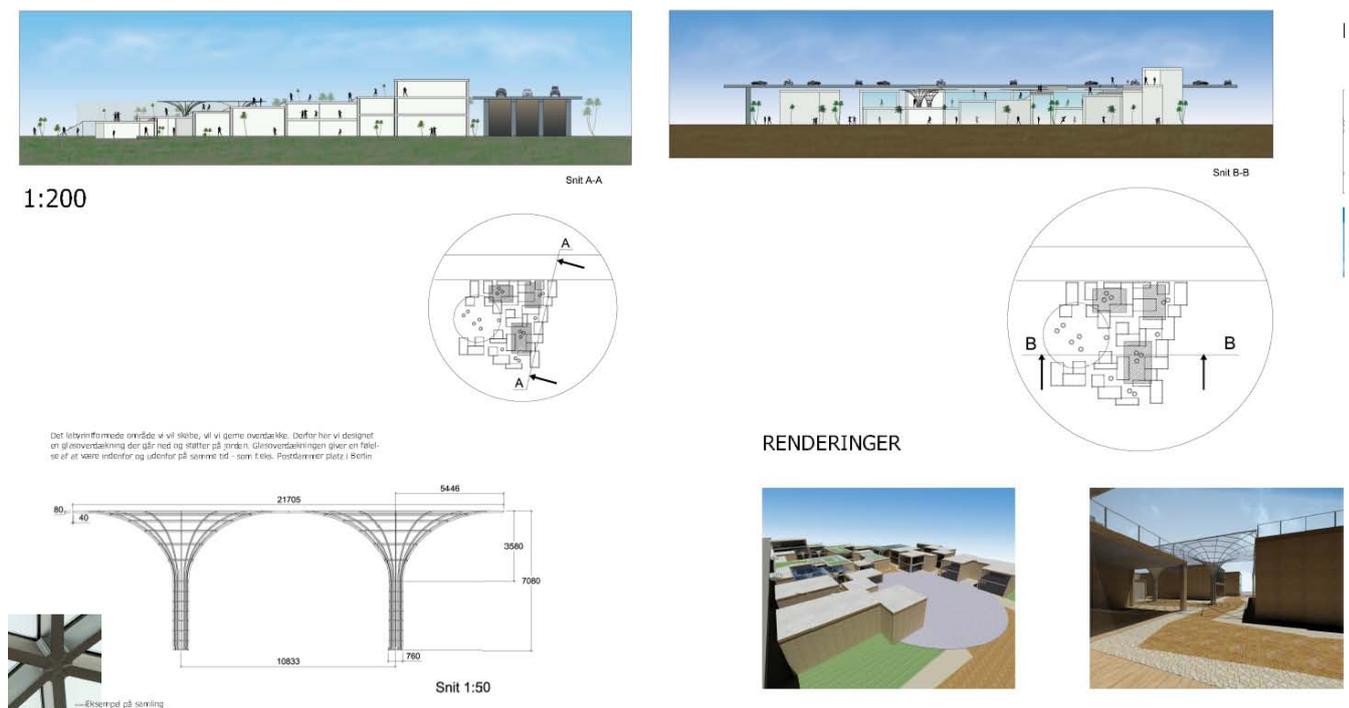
Student project, from the Sept-December part of the course. To the right is the existing bridge. Connecting the bridge to the run-down area below is a new shopping centre. The student project connects from existing bridge to the shunting area by means of roof gardens on a 'Kasbah'.
